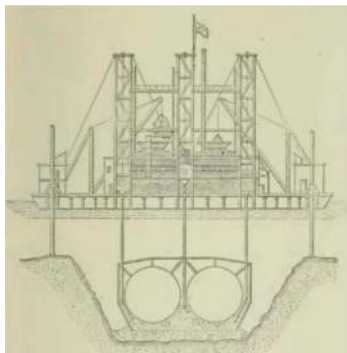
Method of placing concrete by Tremie to ballast the tunnel element in the permanent situation.
